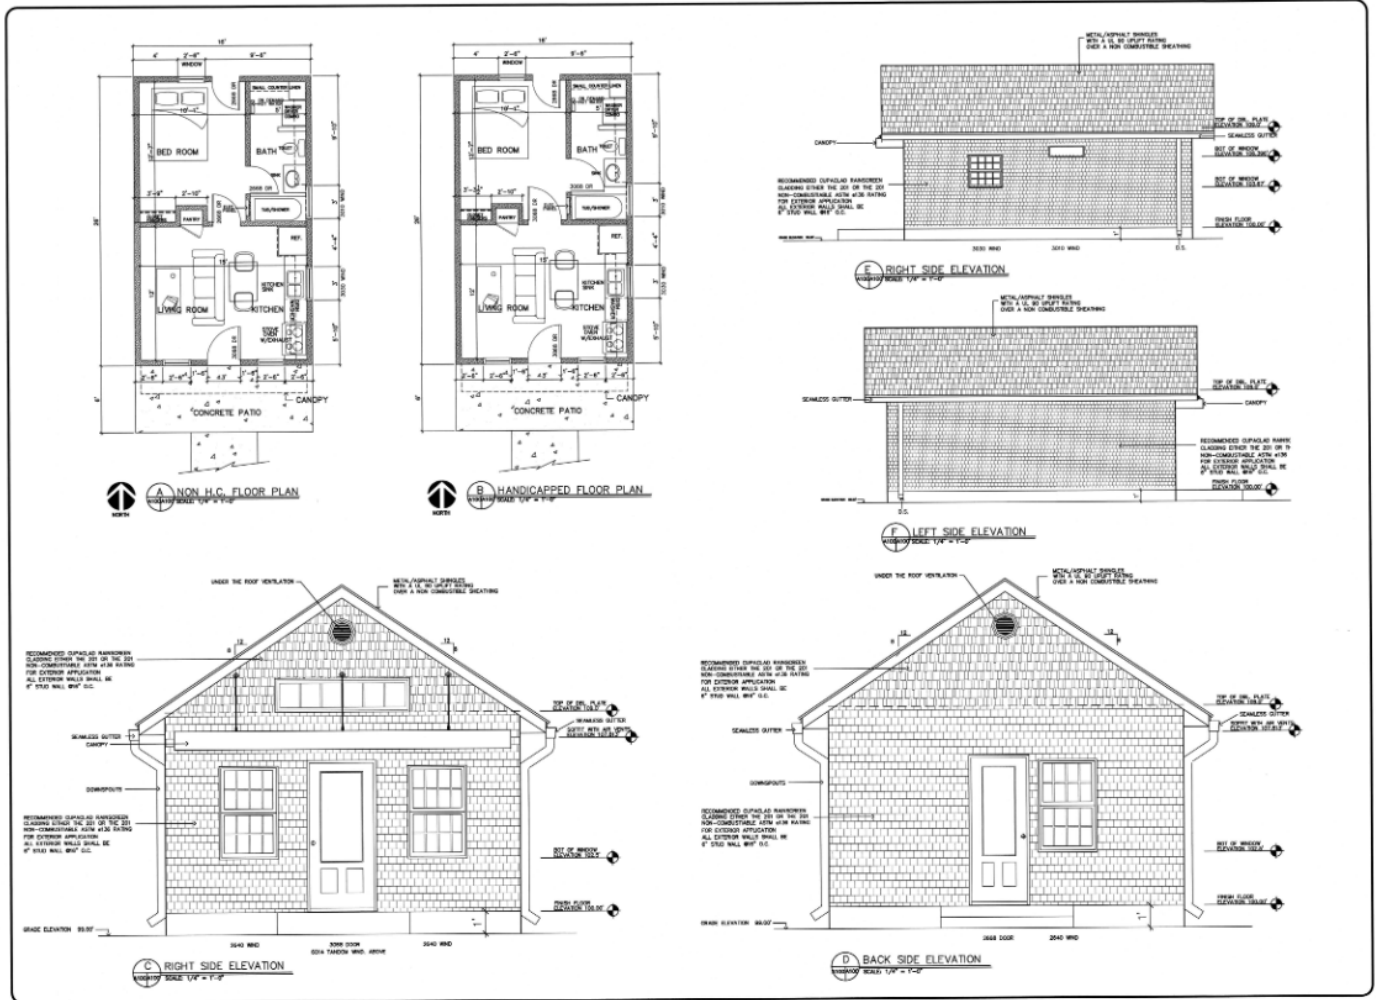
EXHIBIT G – CONCEPTUAL EXTERIOR DESIGN
